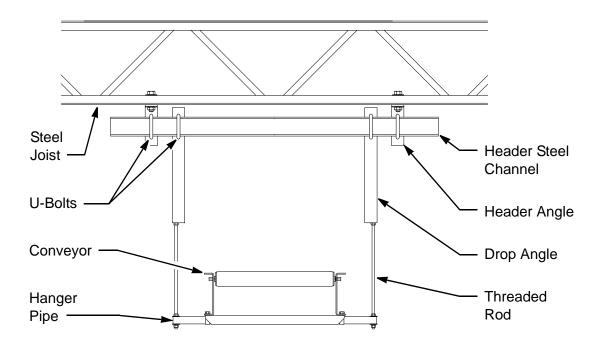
Typical Ceiling Hanger Installation (CH2-A Series Shown)
